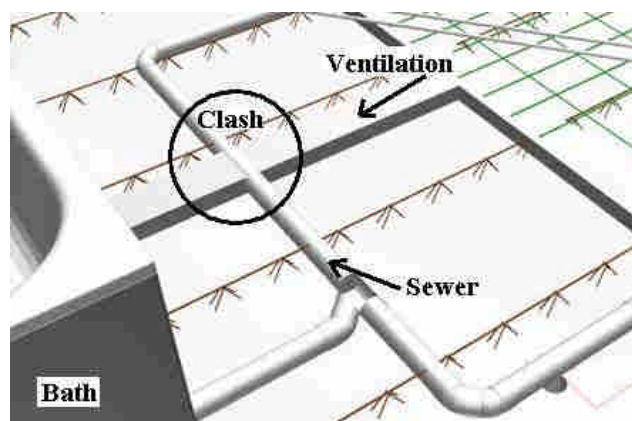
A 3D image of the bathroom of the pilot project detecting a clash problem between a ventilation duct and a sewer water pipe in the semi-prefab floor
